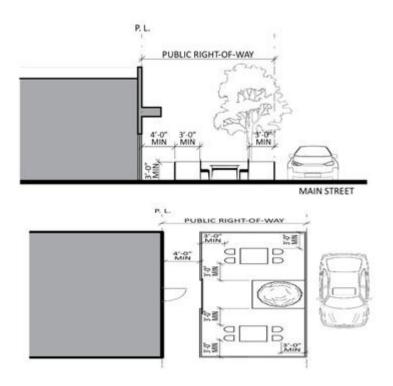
Example of an outdoor dining area in the public right-of-way with a barrier.
